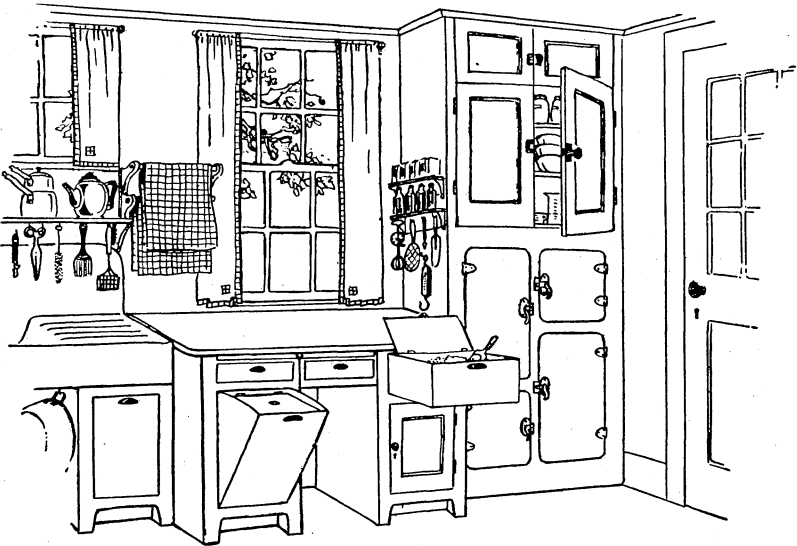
Good use of wall space, according to the plan in Figure 27. The high window over the sink gives good light and ventilation
